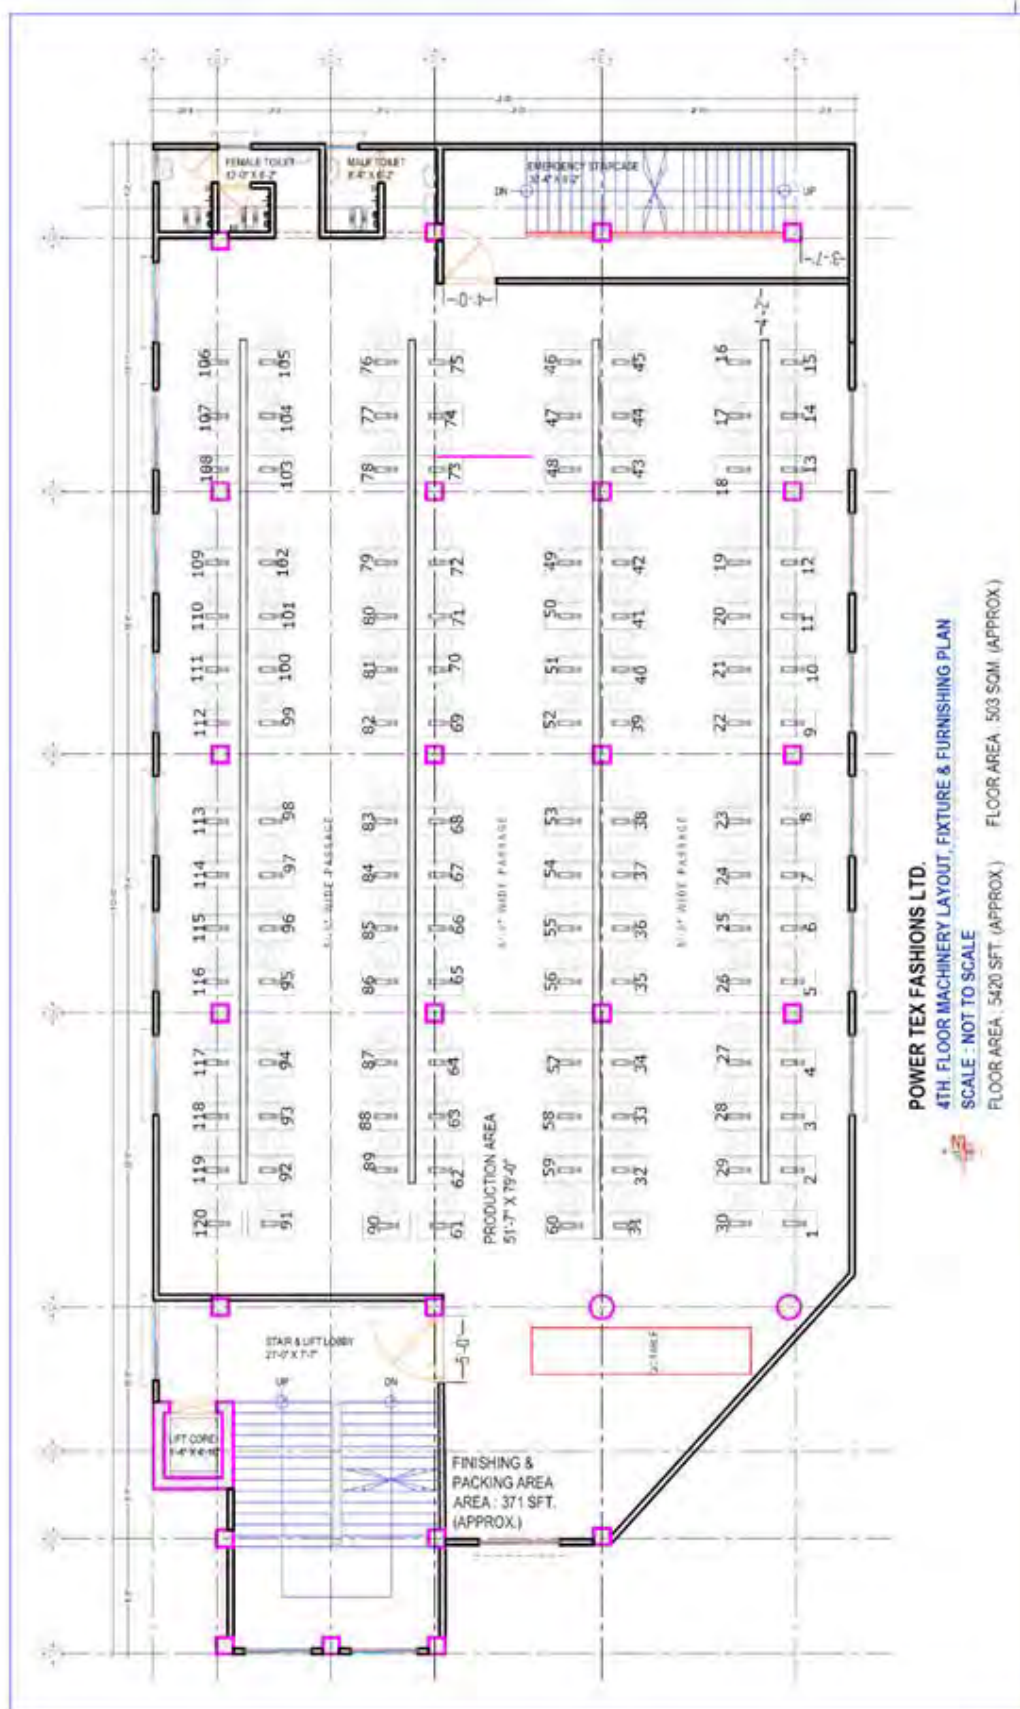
Floor plan of Power Tex Fashion Ltd.
